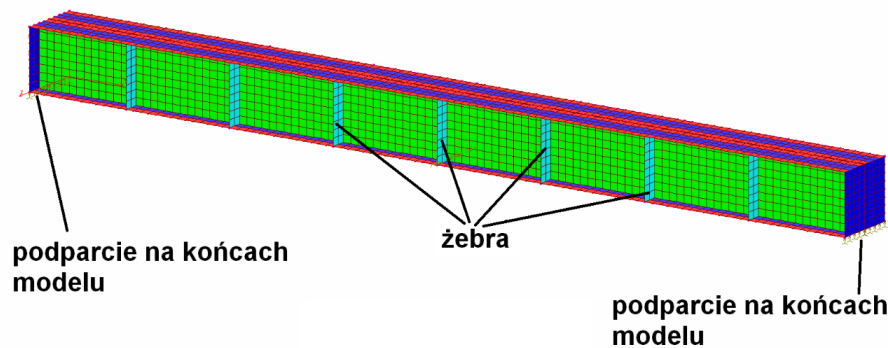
Model of canopy made of a simple I-beam – Beam model.
